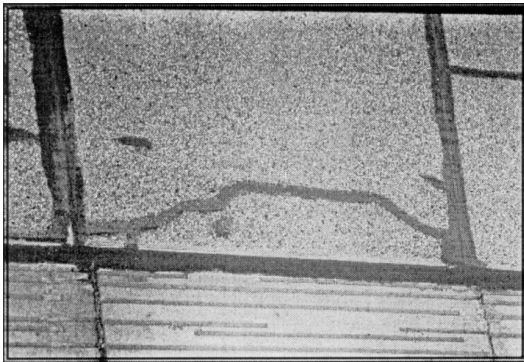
Cracks in the weather protection layer of a concrete sandwich wall.
